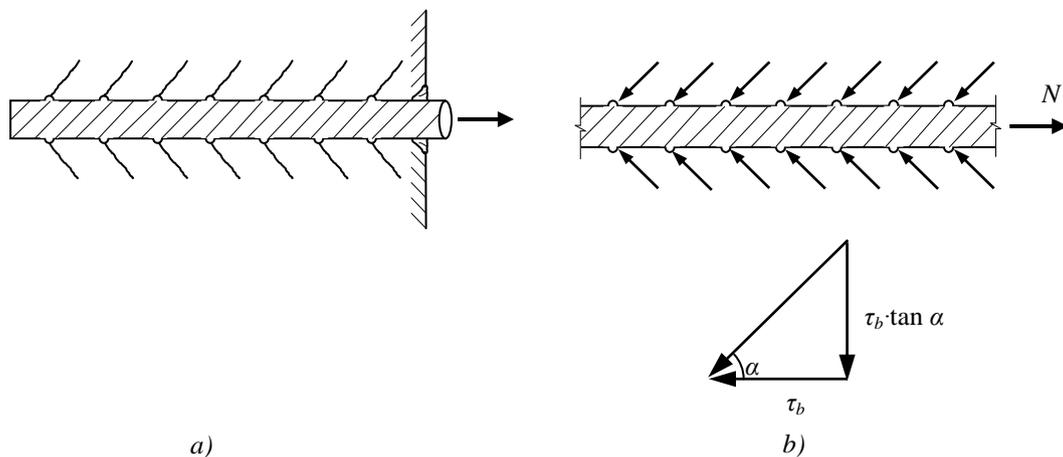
Reinforcing bar subjected to tension, a) inclined cracks occur out from the ribs from the reinforcing bar, b) inclined compressive forces due to shear key effect between the surfaces of the reinforcing bar and the surrounding concrete. The figure is based on Engström (2011a).
